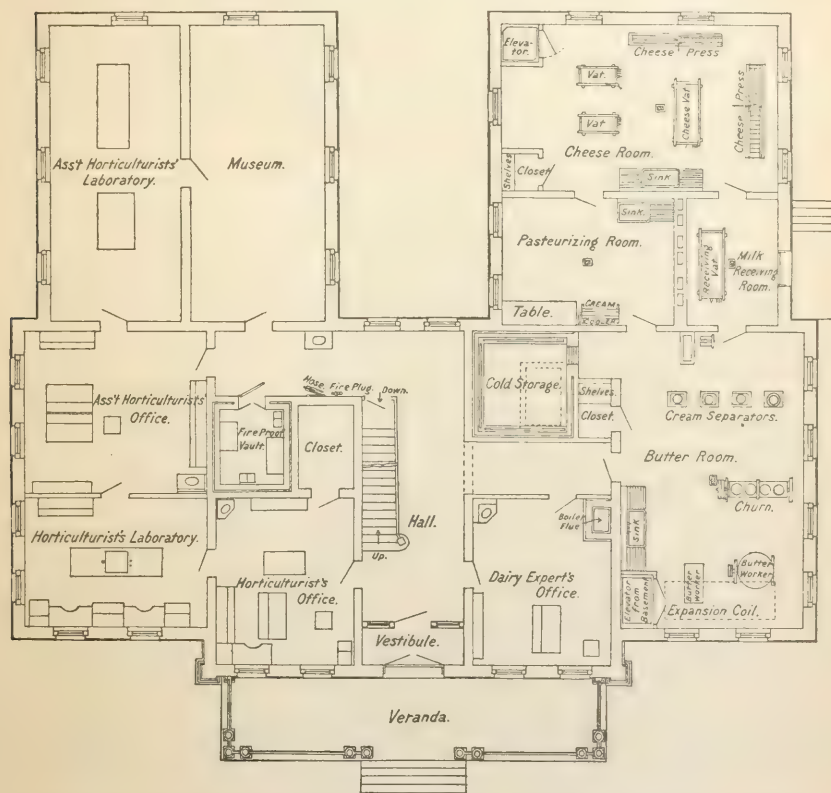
First floor plan of Biological and Dairy Building, New York State Experiment Station.
